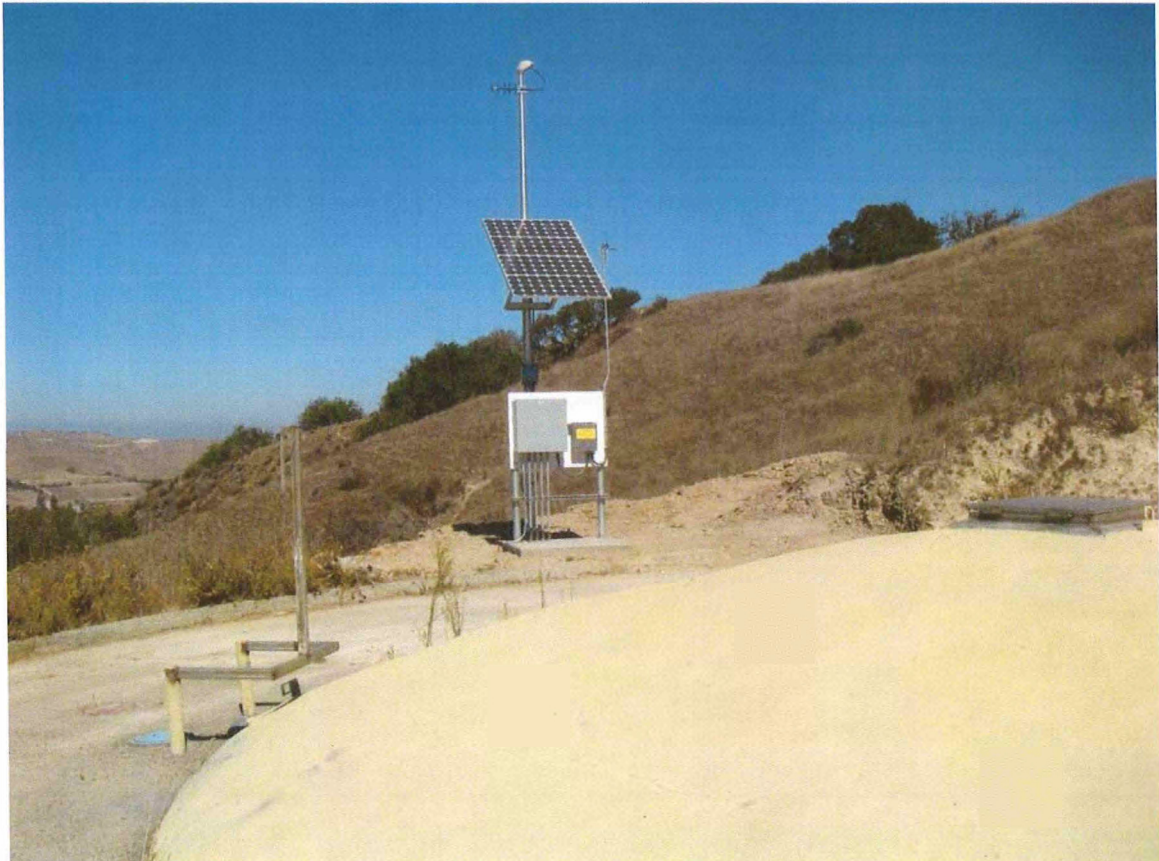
New SCADA-ready PLC with solar power at Vista Dorado tank
